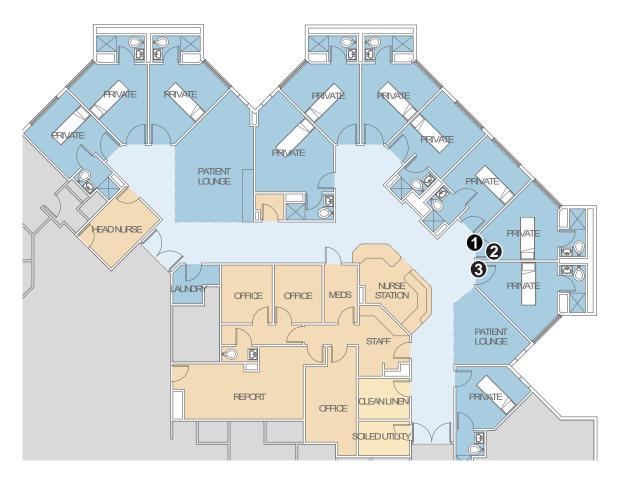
Dartmouth-Hitchcock Medical Center Plan, Floor Plan
